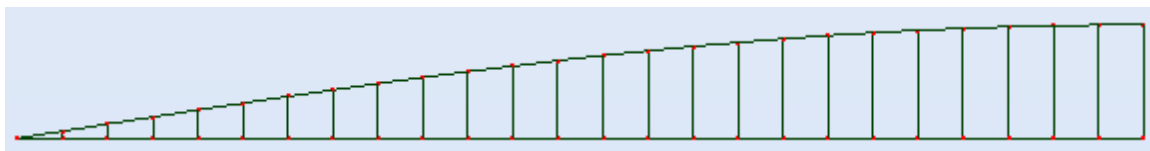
Cross-section of the quarter helix with deck connections
